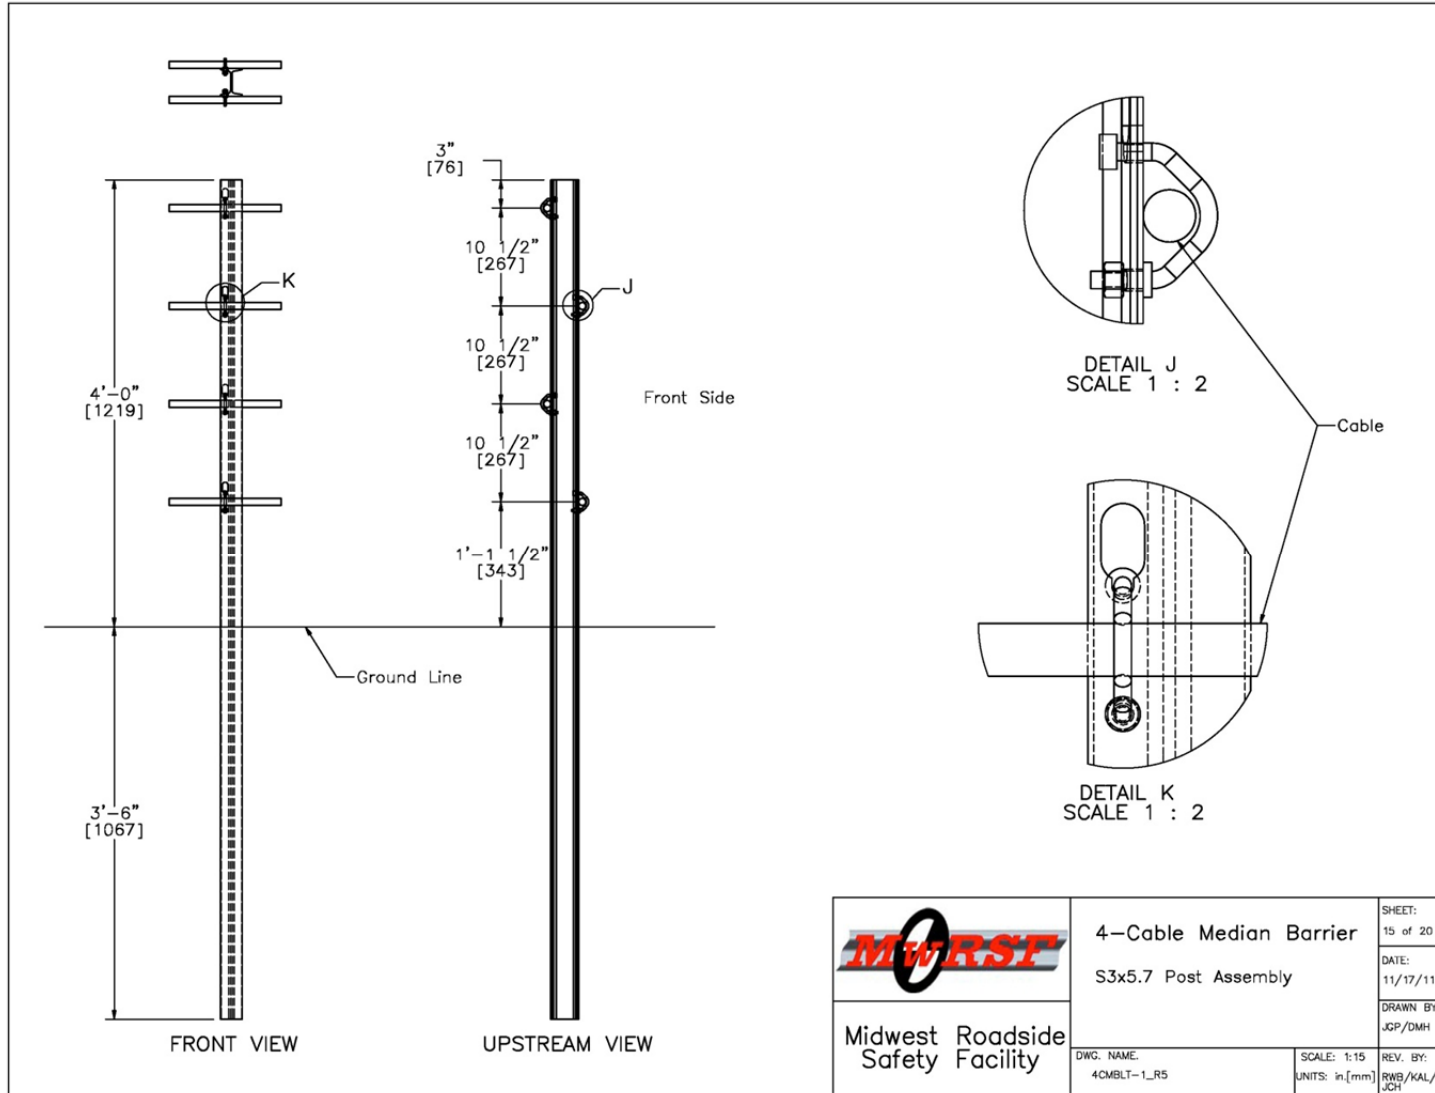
Post Assembly Layout, Test No. 4CMBLT-1
